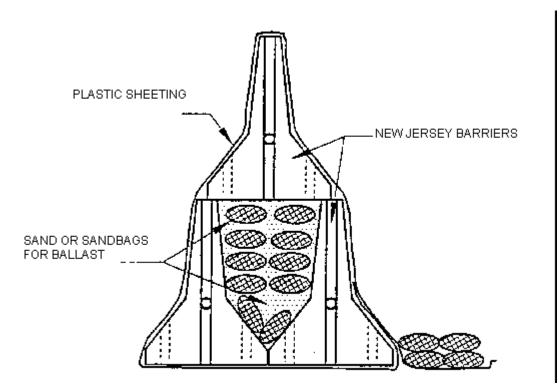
JERSEY HIGHWAY BARRIERS – STACKED UNITS
